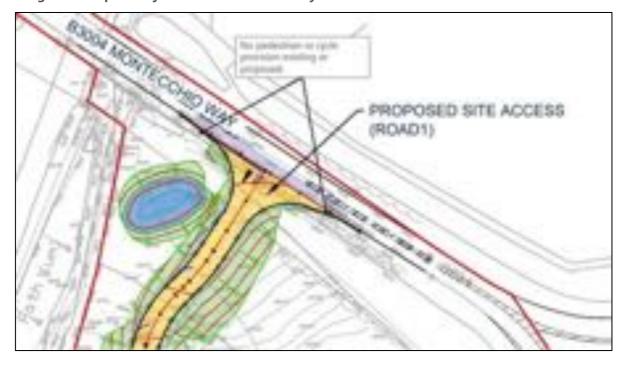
Proposed Lynch Hill Montecchio Way Access
